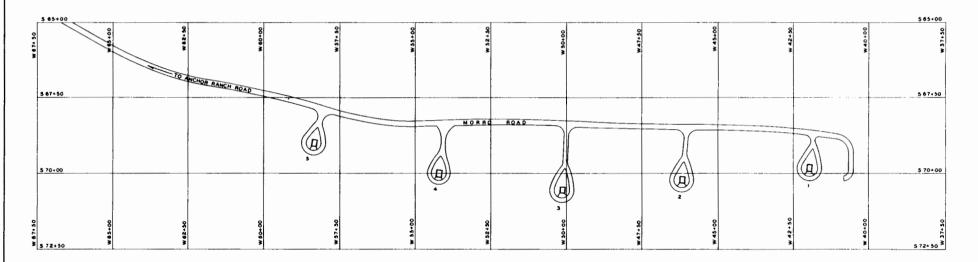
Structure Location Plan for TA-28 - Magazine Area-A (1983 Drawing from the LANL Technical Area Structure Location Plans)
